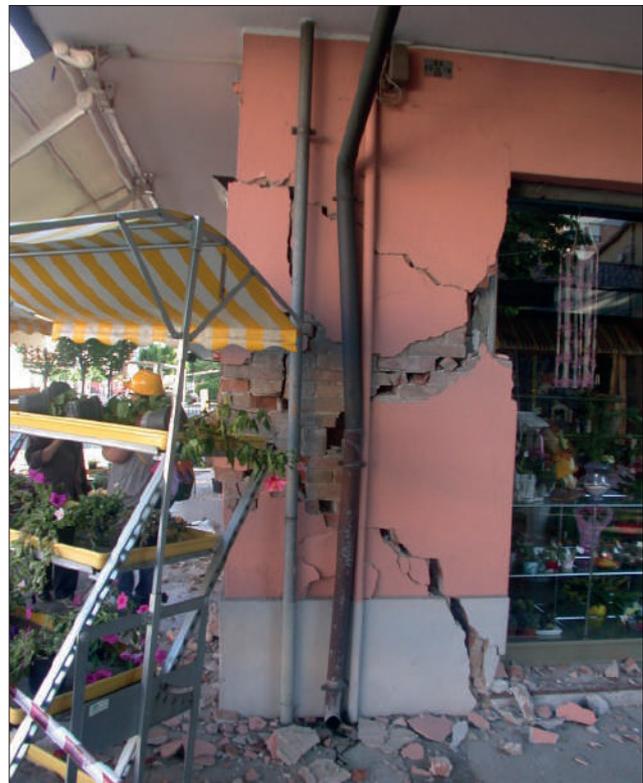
Heavy diagonal cracks with partial loss of connection between external walls (damage of grade 4)
